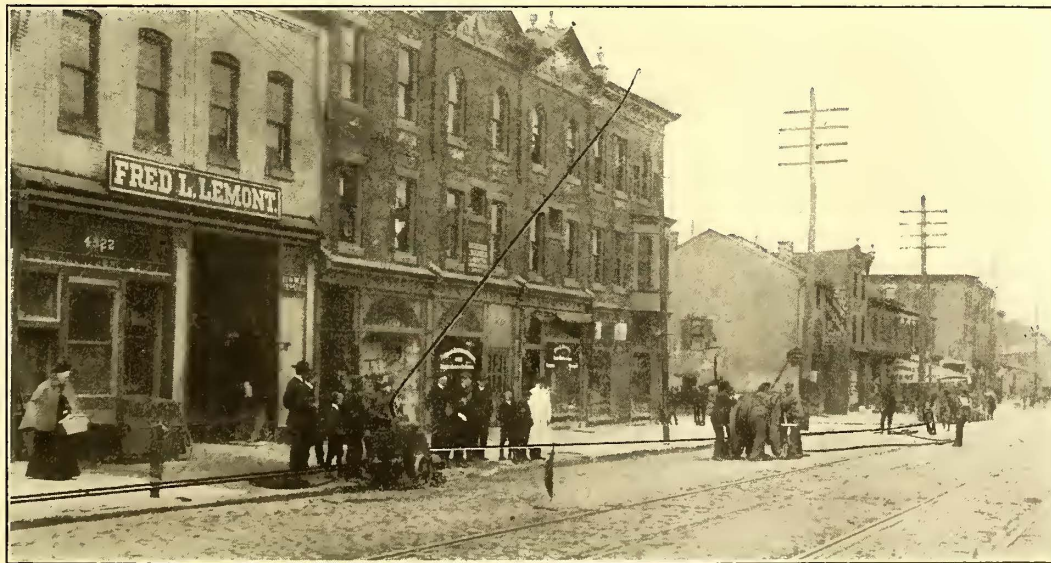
DRAWING IN CABLES WITH ELECTRIC WINCH
